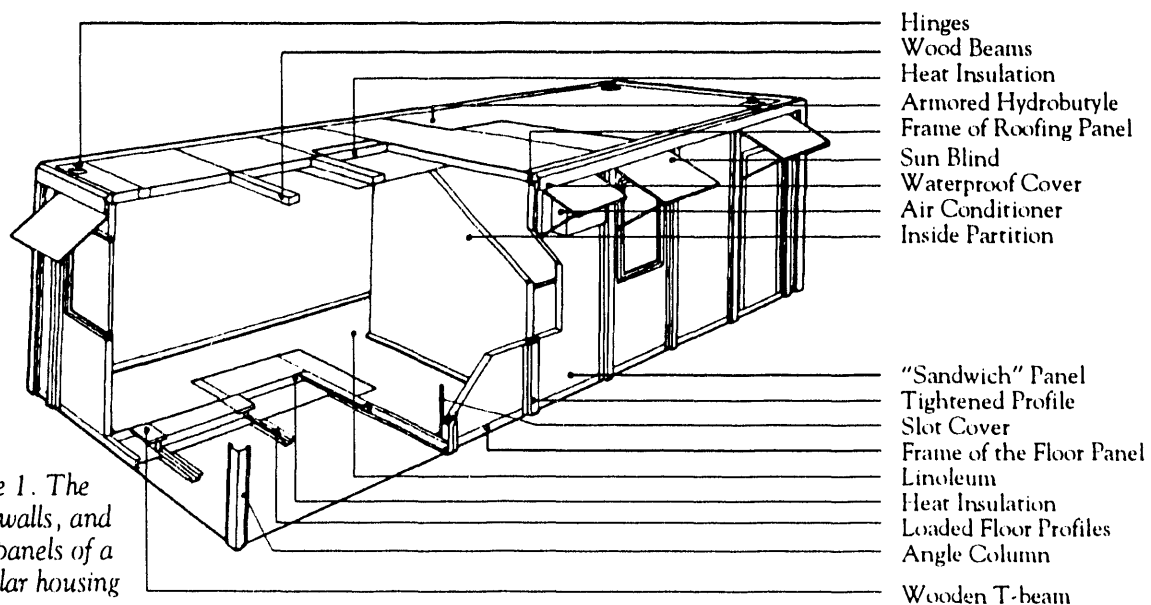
The roof, walls, and floor panels of a modular housing unit.
